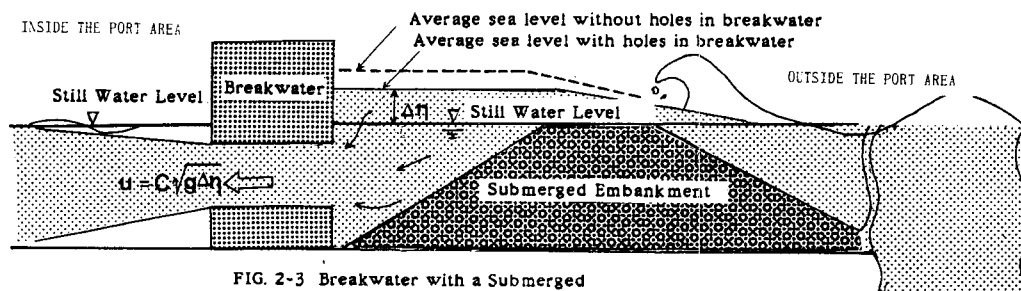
Breakwater with a Submerged Embankment-Conceptual Drawing
